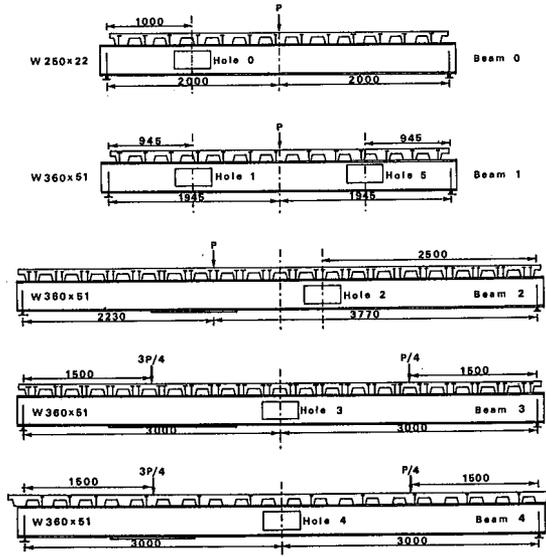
Beams Tested by Redwood and Wong, not to scale (Ref. 11)
